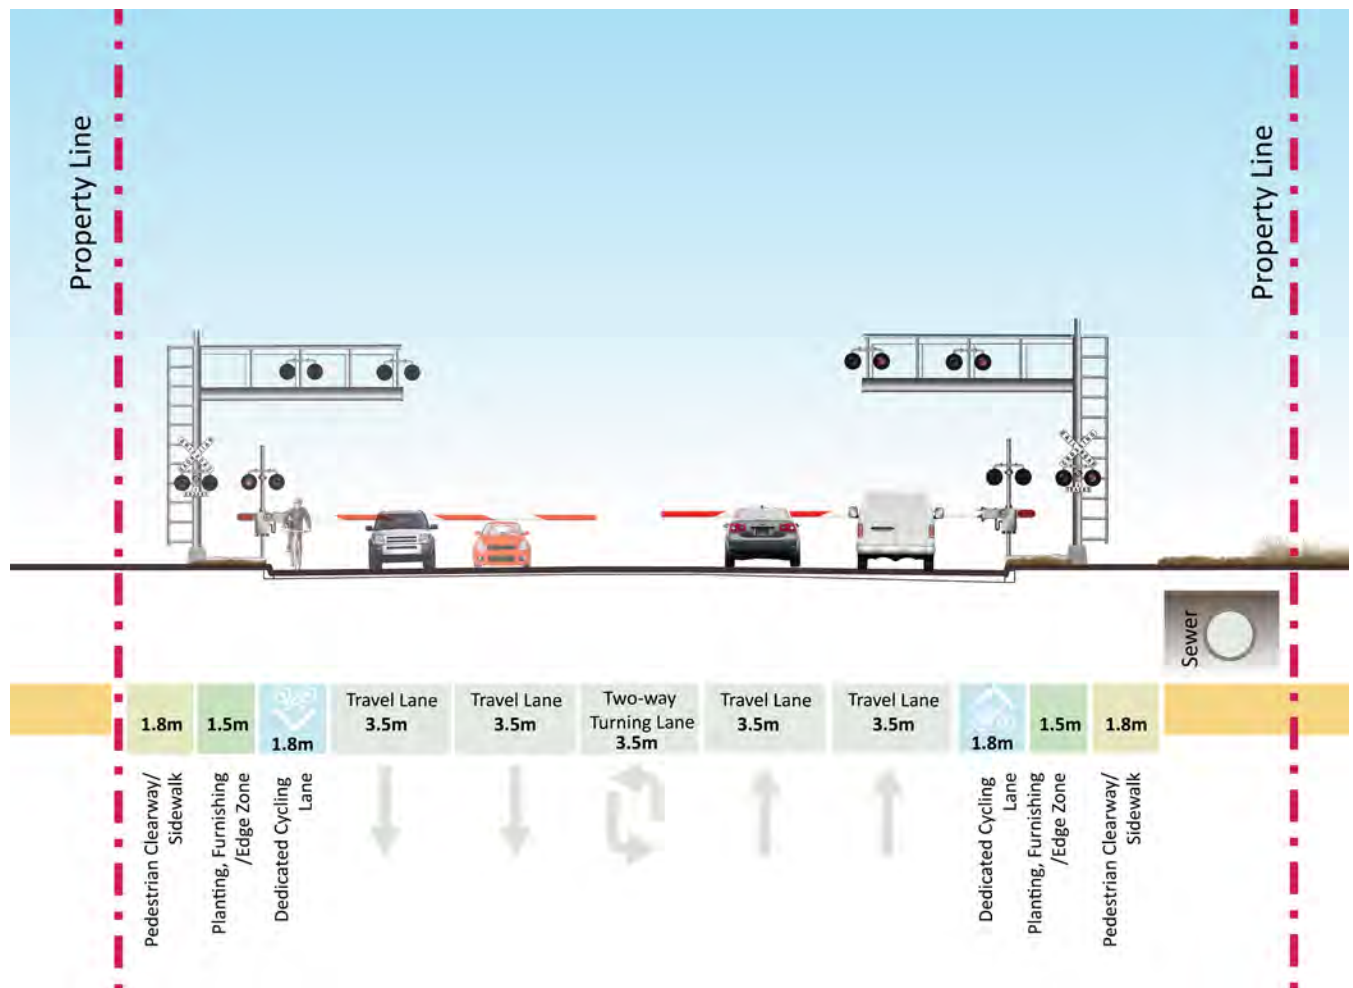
Initial Stage Cross Section - Casablanca Boulevard at the CN Rail Crossing
